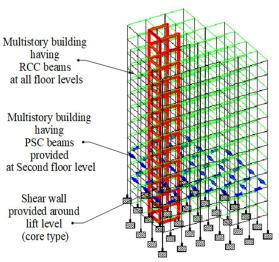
Model OPSC-BII - General Structure with PSC beam provided and interchanged at second floor
